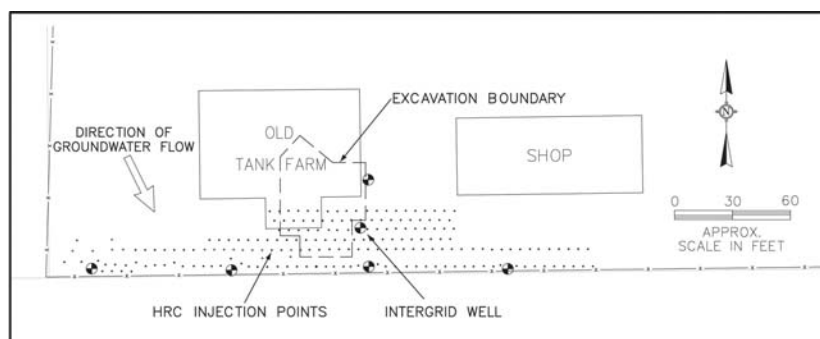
Site plan showing former tank farm, area of soil excavation, and injection point locations.
